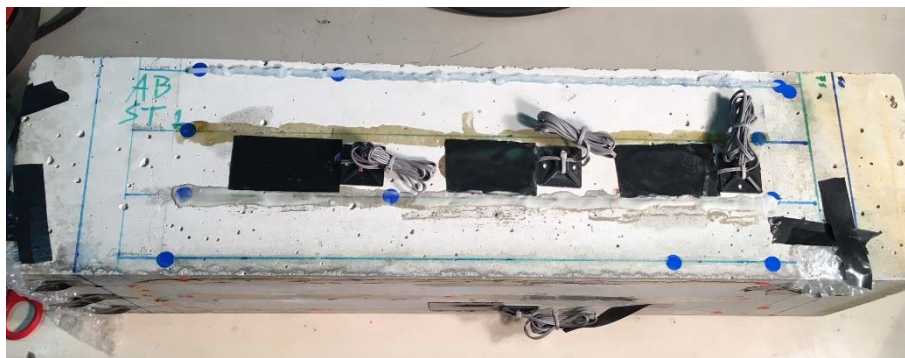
View of the sensors (DOFS and strain gauges) instrumented in the bottom surface of the tested beam
